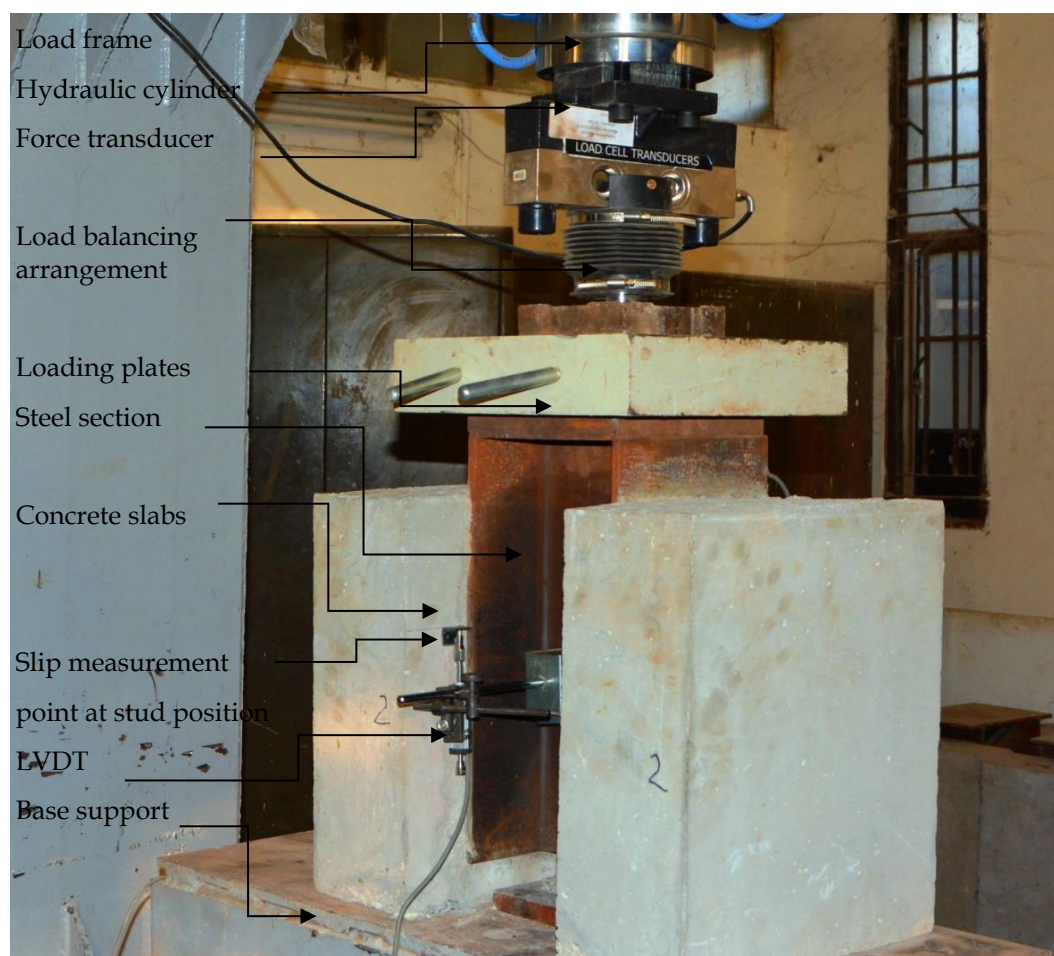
Arrangement of Push out test assembly with loading arrangement for load-slip
